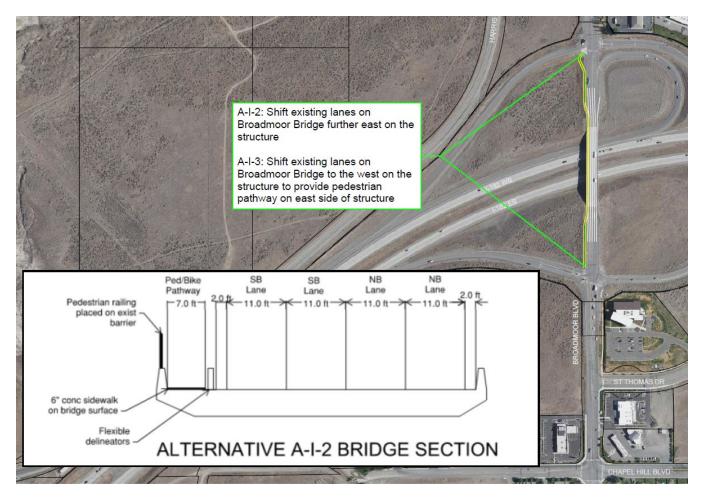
ALTERNATIVE A-I-2 (BROADMOOR RE-STRIPING) CONCEPTUAL LAYOUT
